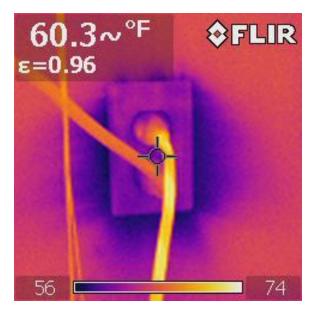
Infiltration Detection—Electrical Outlet on Exterior Wall
